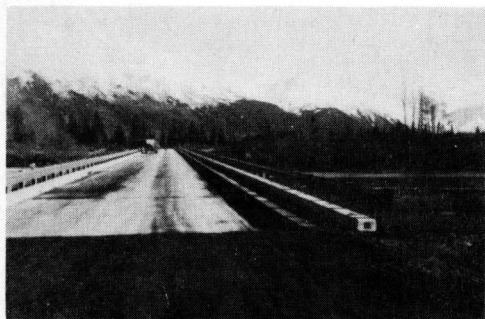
Placer River Bridge, Alaska - View of Completed Trestle
